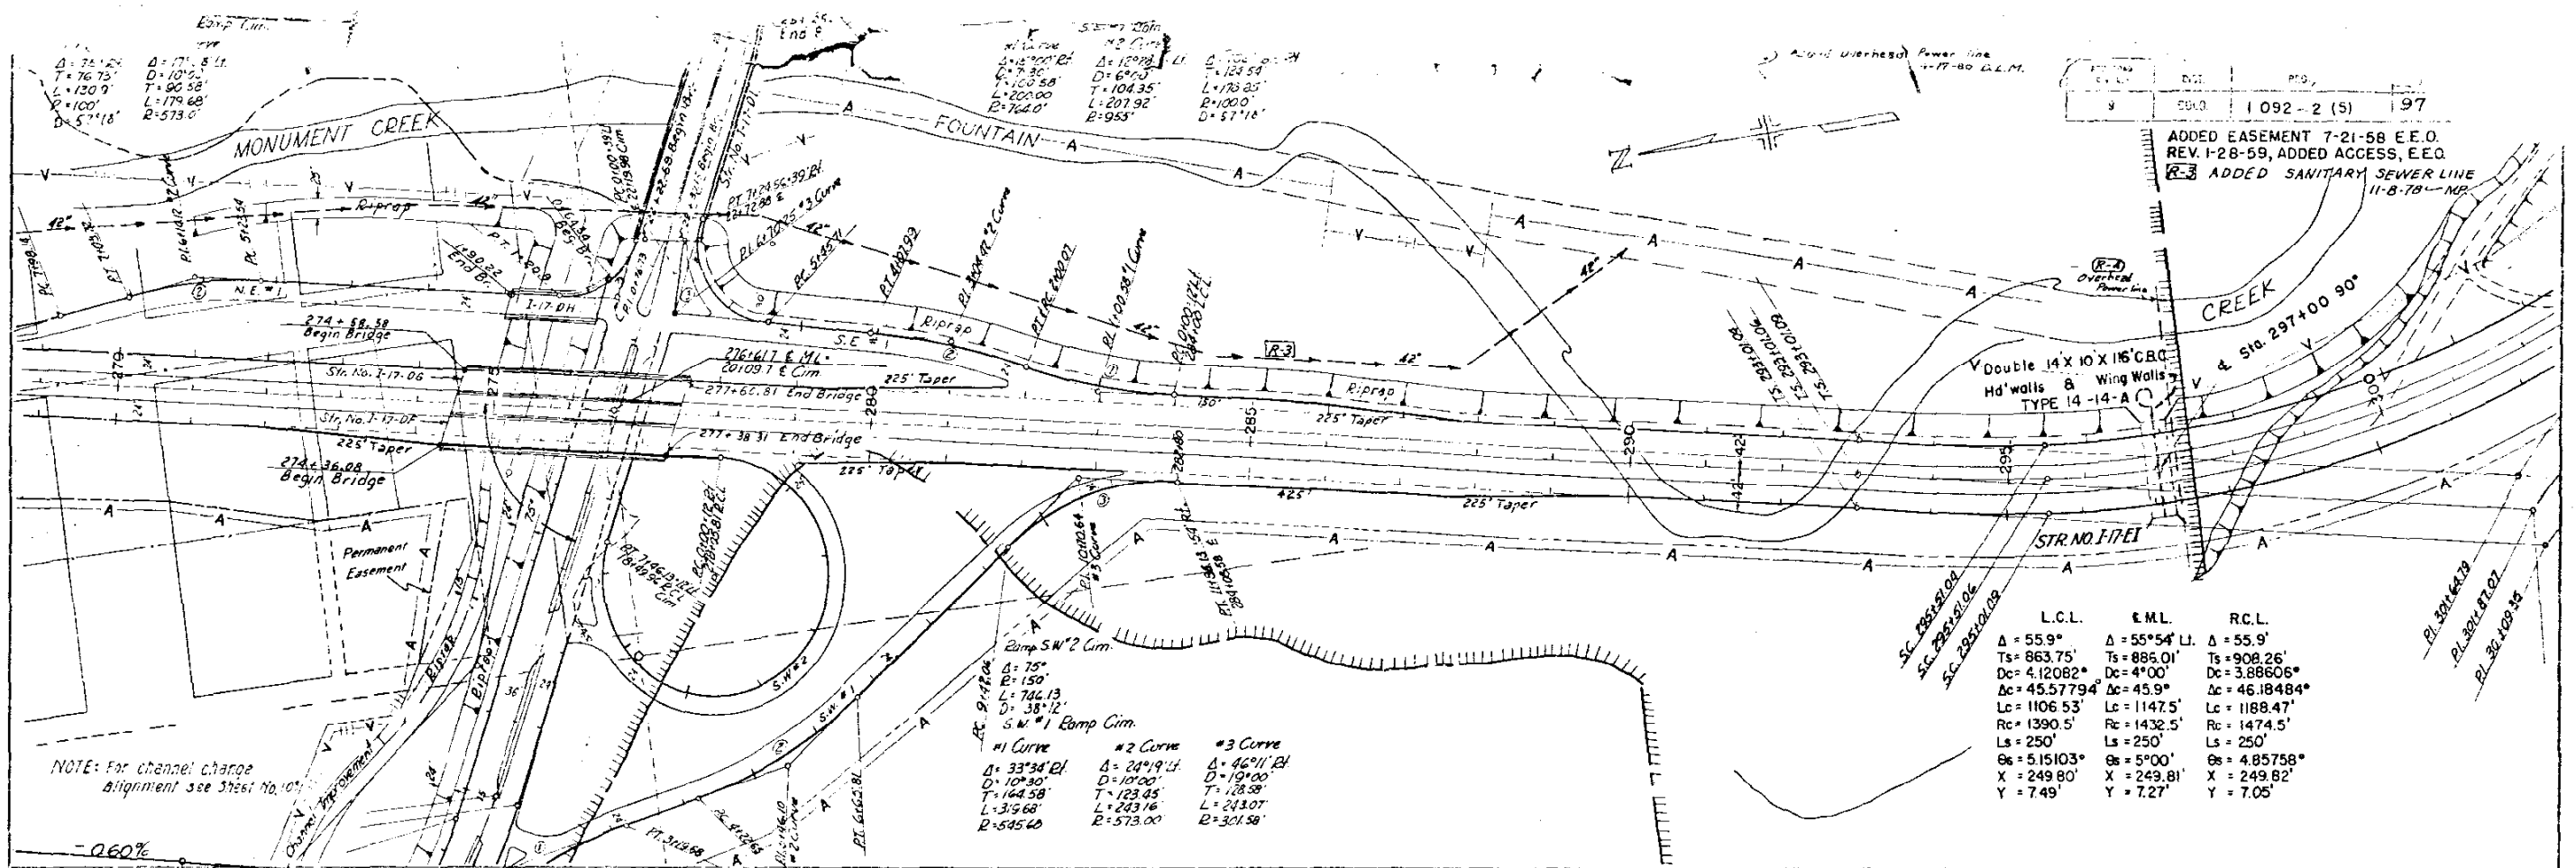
PLAN-PROFILE OF A.A.R.E. ST. 266+80.7
